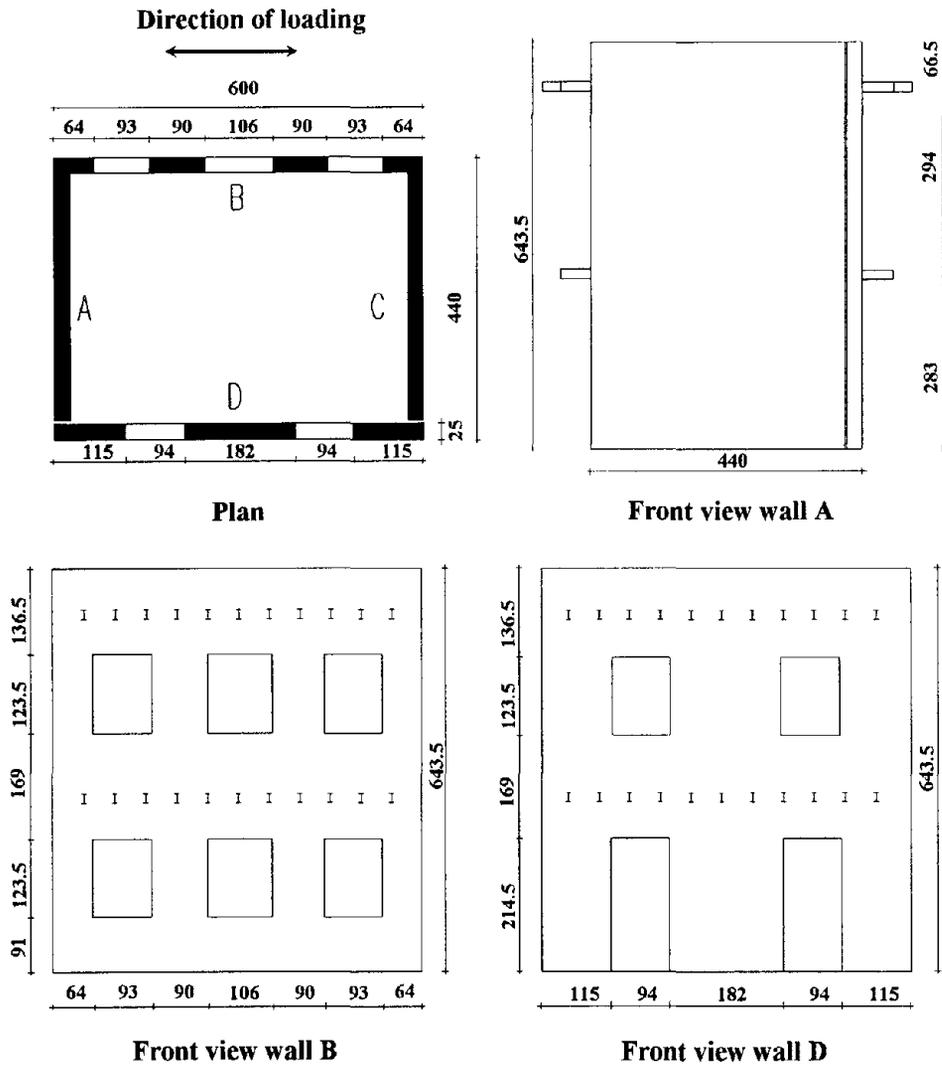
Plan, front, lateral views and dimensions of the prototype, dimensions in centimeters.
